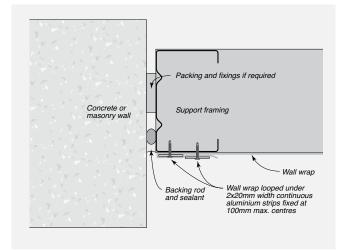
Vertical Wall Wrap Junction – At Control joint
